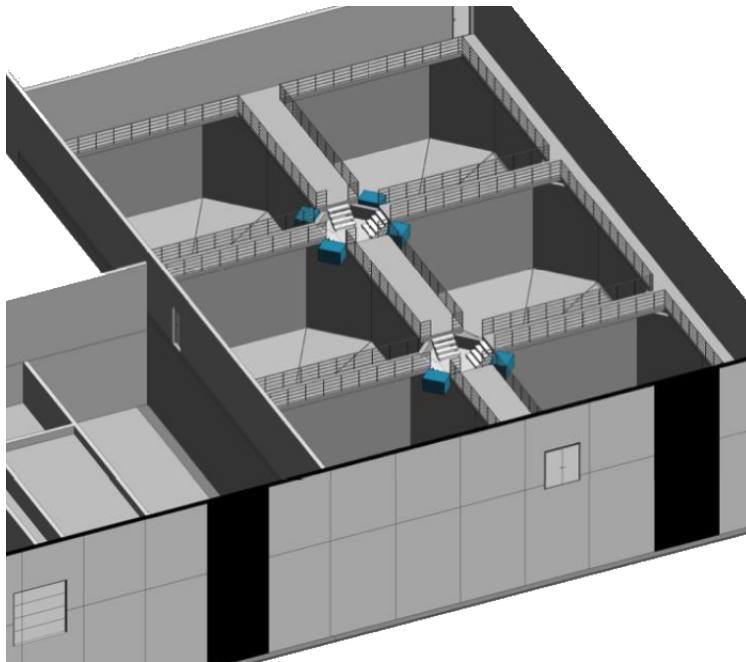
Modern smolt breeding plant currently under construction, OverhallaBetongbygg (2015)
